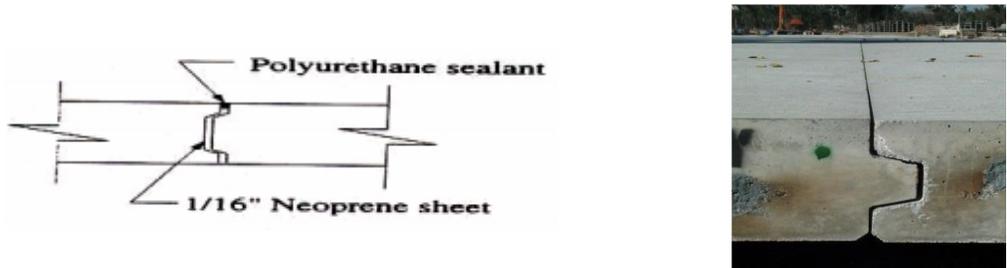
23 Non-grouted panel to panel (male-to-female) joint [[56], [58]]
